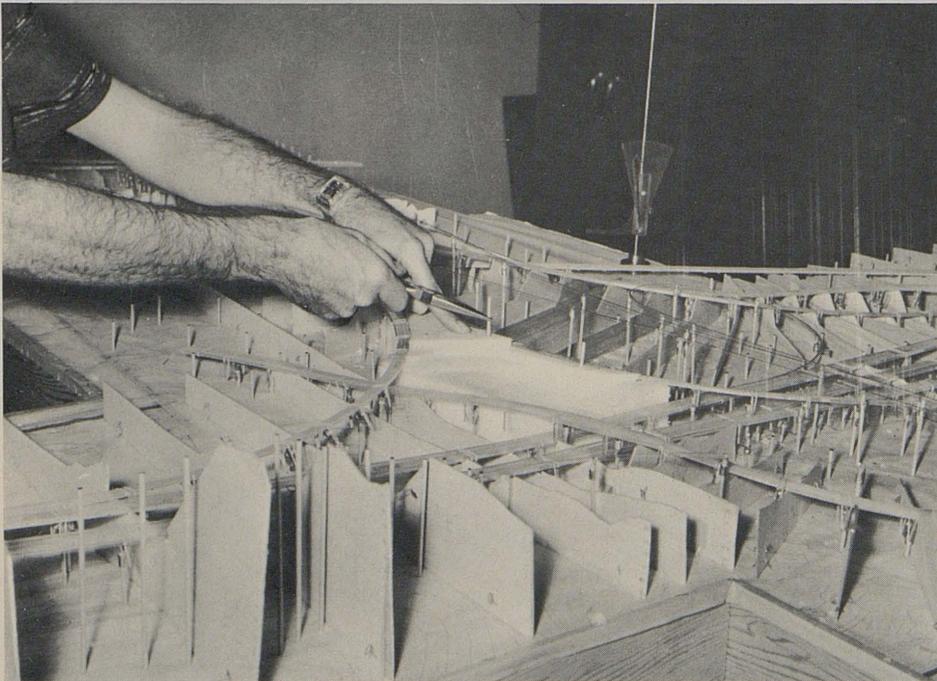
DETAIL OF TOOL USED IN SETTING AND CHECKING SUPERELEVATION
